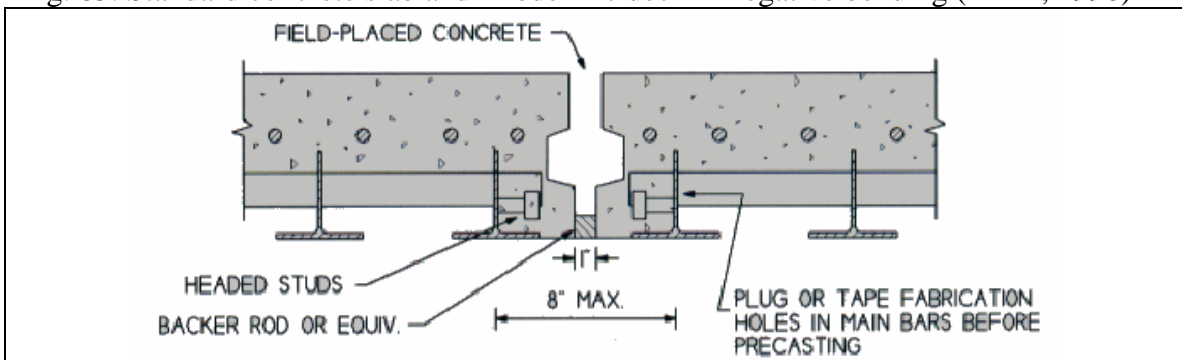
Typical transverse joint detail for precast applications (EBDI, 1998).
